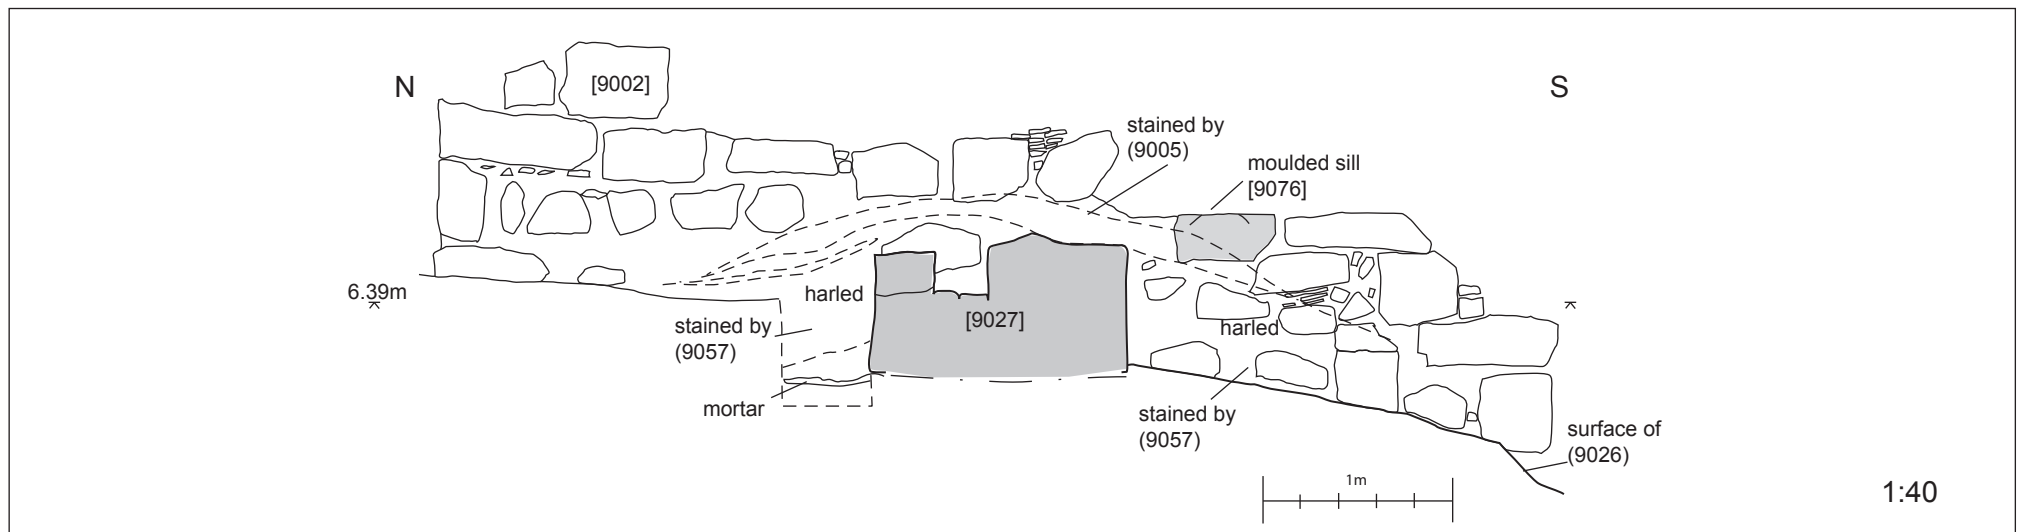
Elevation of west wall [9002] and buttress [9027] showing position of moulded window sill and staining caused by accumulation of burnt shale deposits
